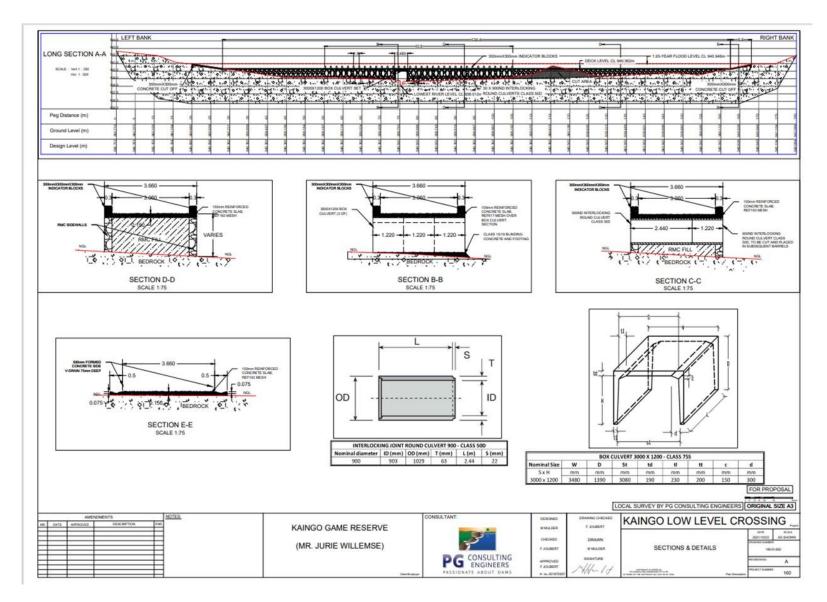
The sections and details of the proposed Kaingo low level crossing at Site 1.
